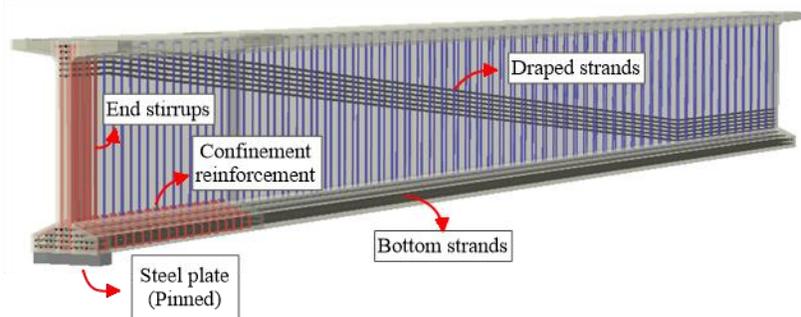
New detailing technique proposed by TRANS-IPIC researchers for PC bridge girders using shape memory alloys
